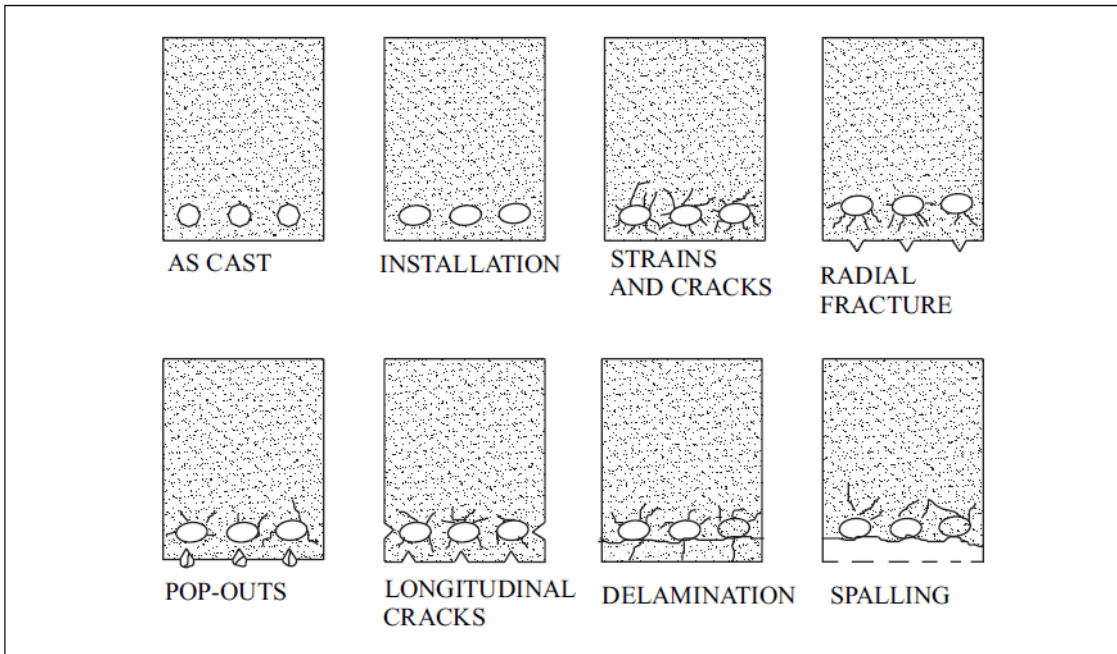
Symptoms of corrosion in a reinforced concrete beam
